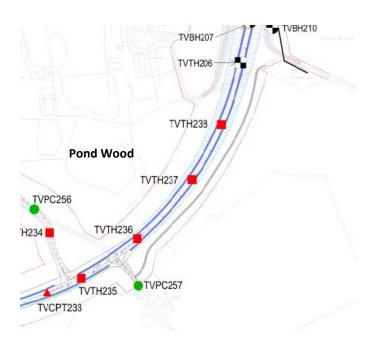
Exploratory hole plan for cutting adjacent to Pond Wood
